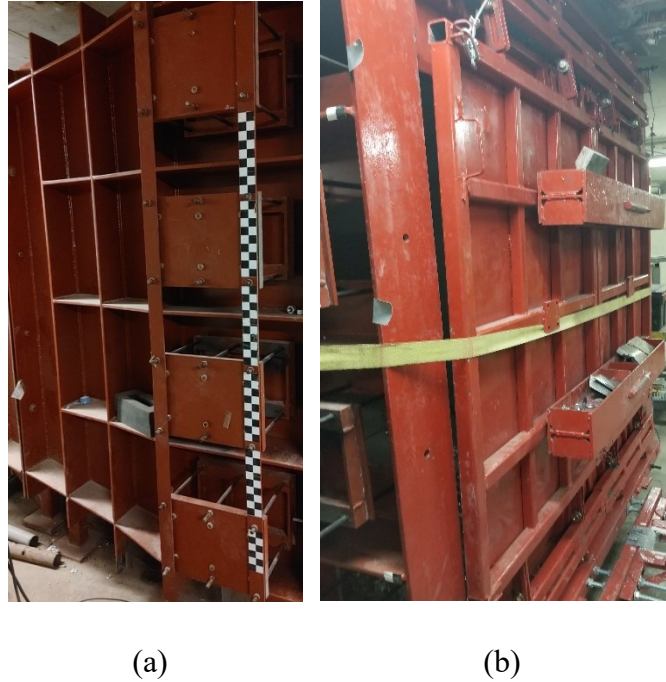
View of the end frame side, showing vents and expansion section. (a) View of Load Transfer Device without specimen, with retaining strap. (b)
